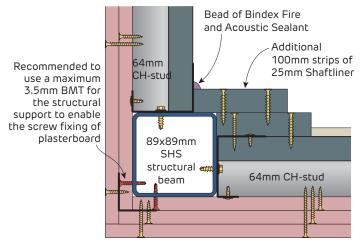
Alternative Detail using SHS Beam with 64mm CH-Studs
